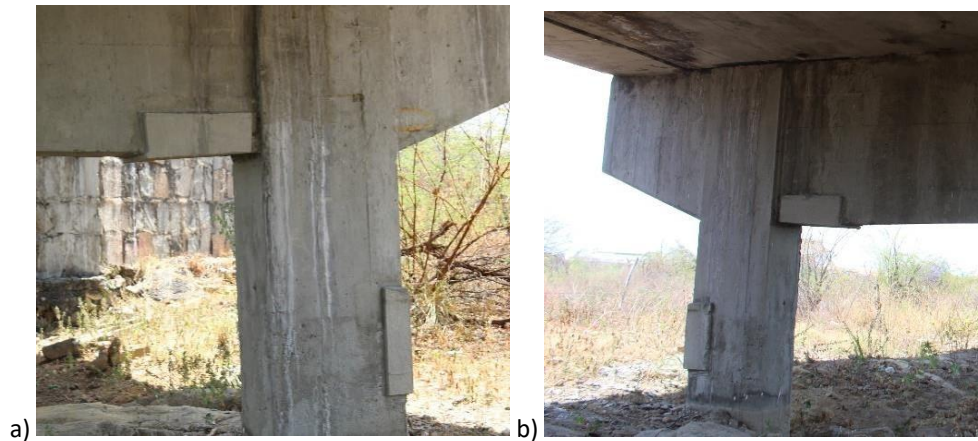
Damage repaired to reinforced concrete pillars and crossbeams
